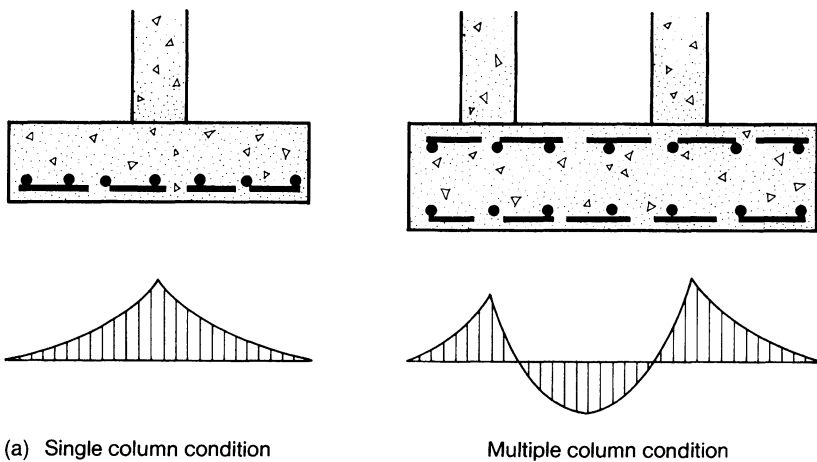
Typical reinforcing arrangement in footings for single and multiple column conditions.
